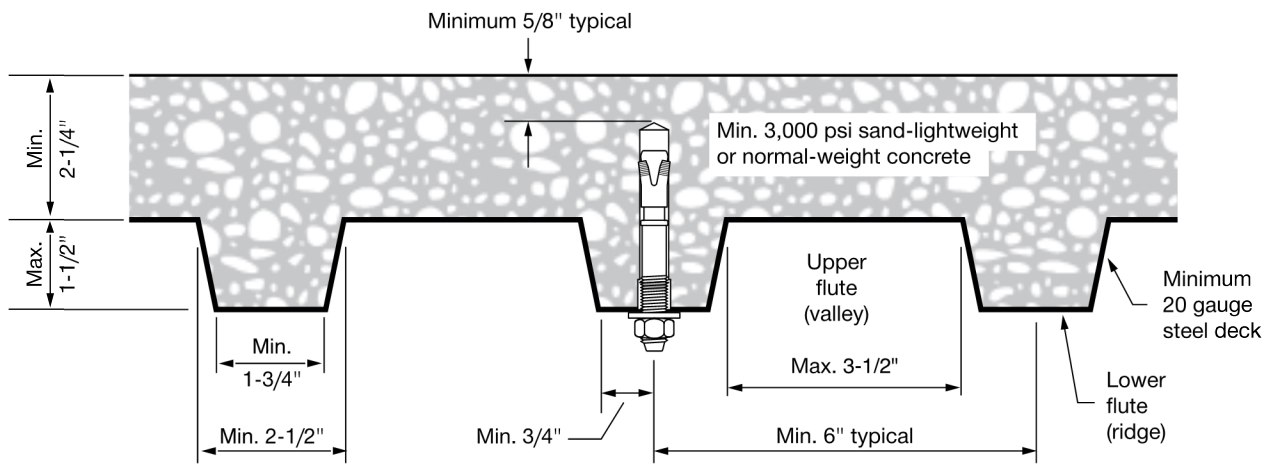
Installation of KWIK Bolt TZ in the soffit of concrete over metal deck floor and roof assemblies - B Deck
